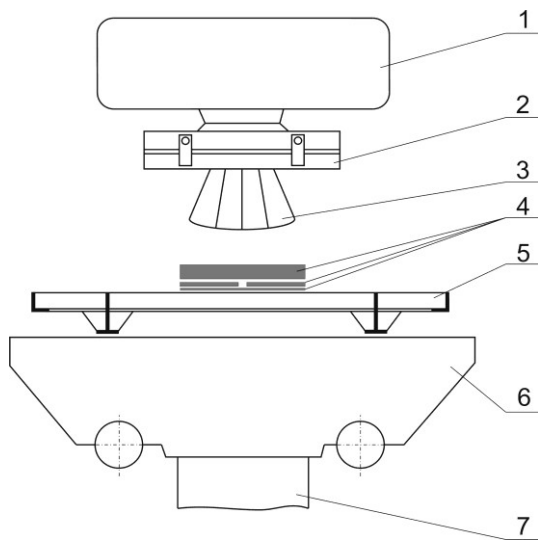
Half-sized span loading scheme: 1 – upper cross-beam, 2 – male core mounting system, 3 – male core, 4 – washers, 5 – span under test, 6 – trolley, 7 – lower movable cross-beam
